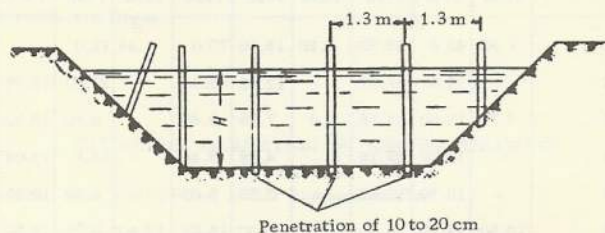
Diagram illustrating installation of the pipes in the canal
